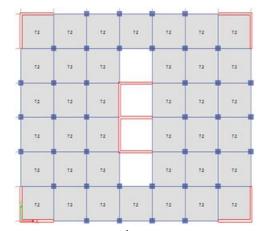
Plan of Building at  $18^{th}$  Floor level (LL = 7.2 kN/sqm)
